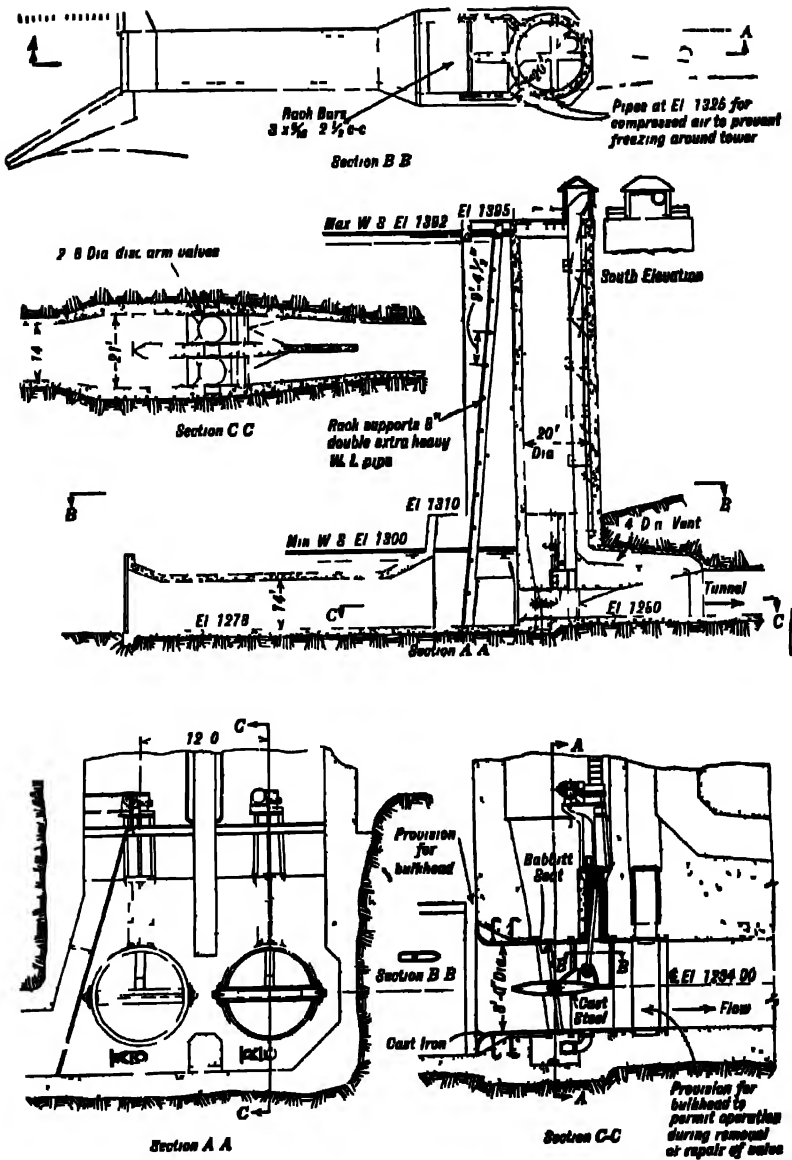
High-pressure tunnel with the Davis Bridge development, Vermont (New England Power Co)
